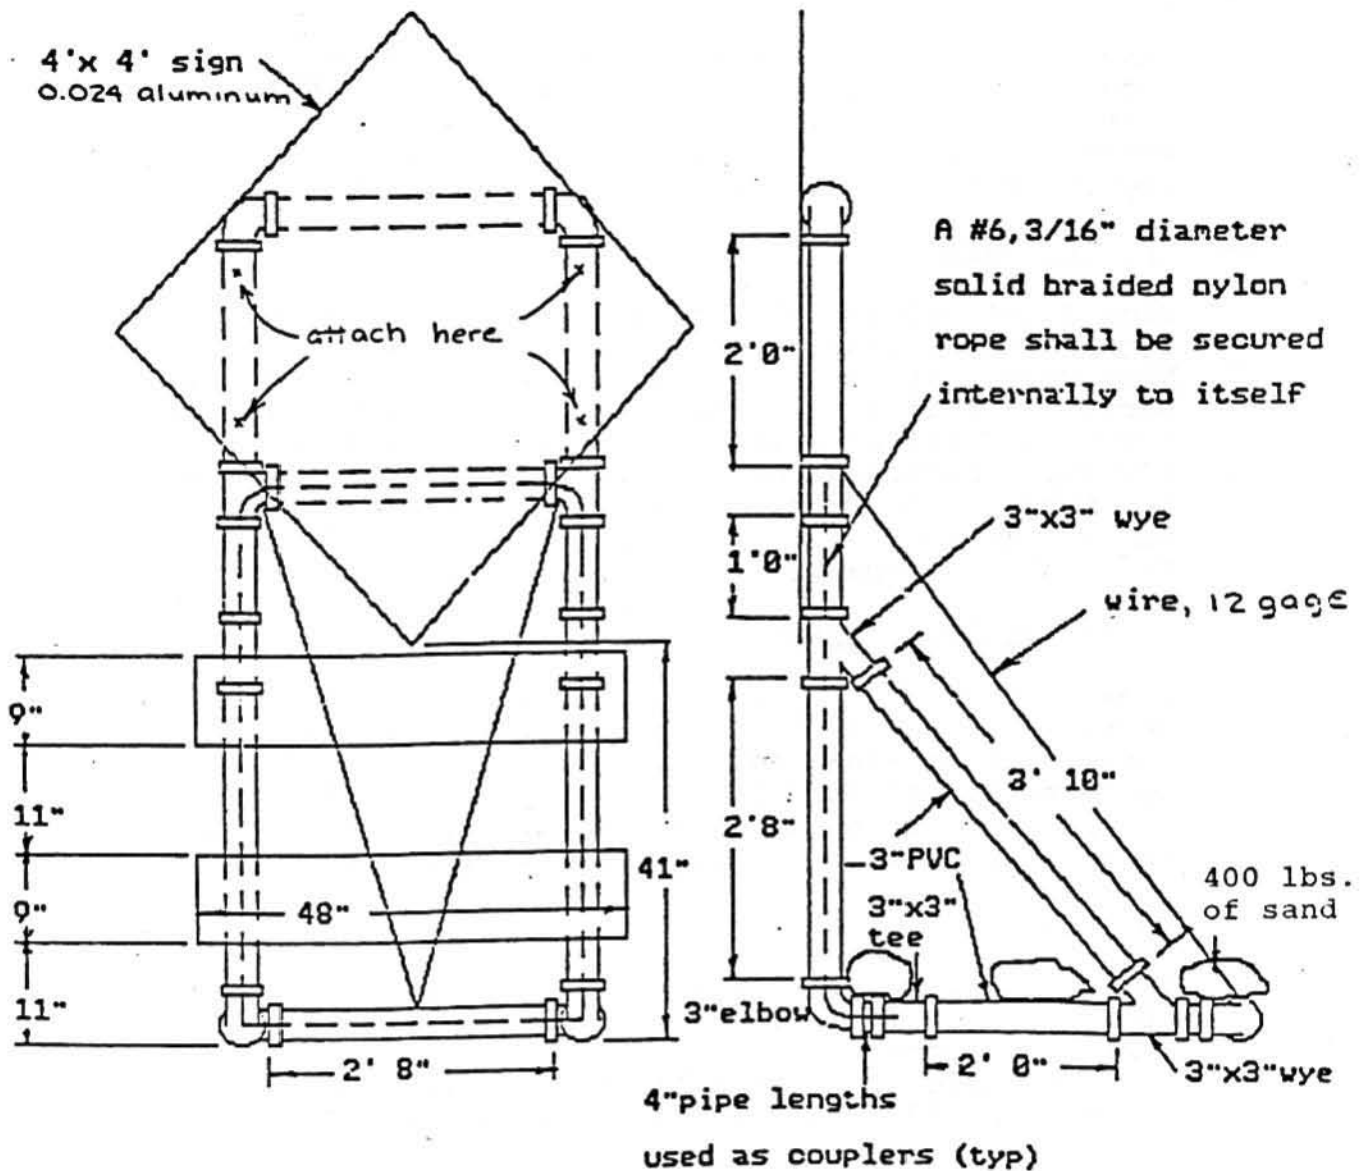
Breakaway Barricade For Test No. 5 and Test No. 6
